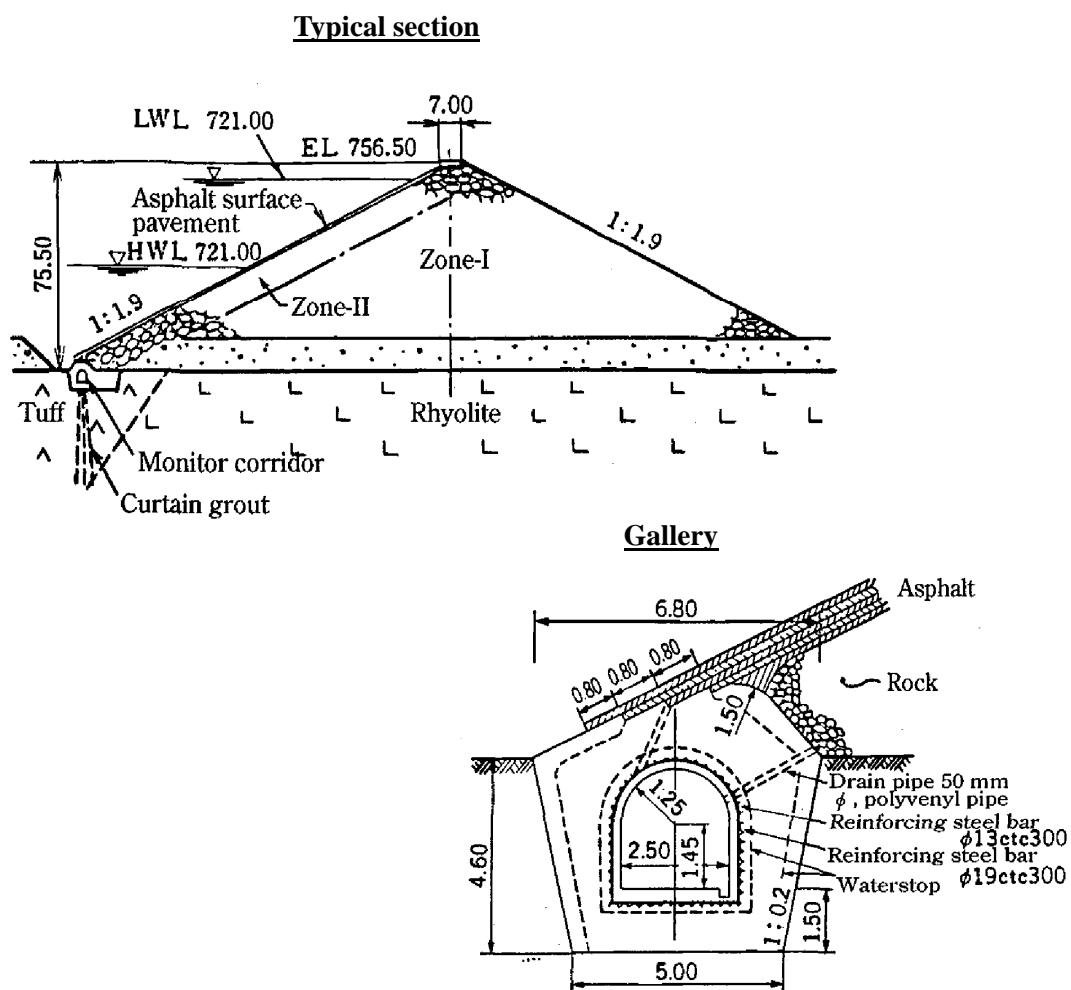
Asphalt Facing Rockfill Dam (Miyama Dam)
